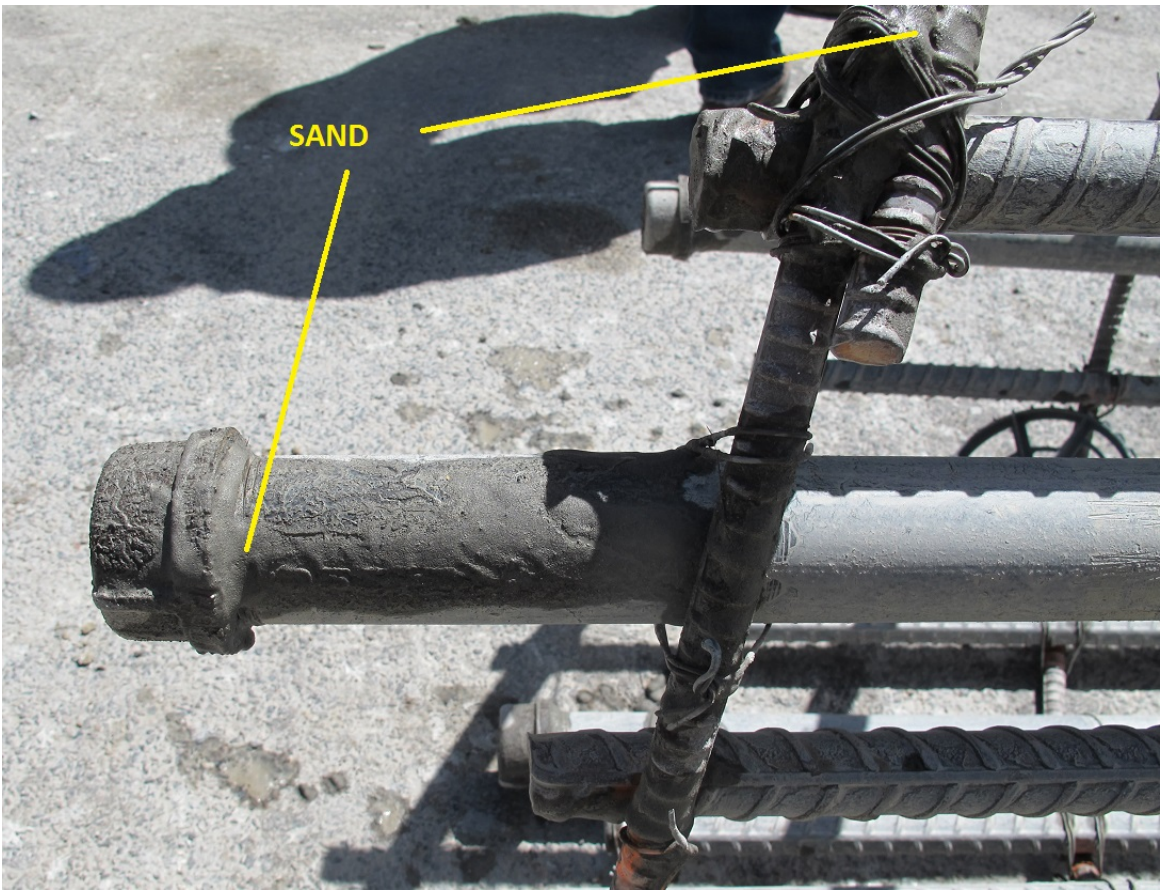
Shaft 4 Reinforcing Cage / CSL Tube
